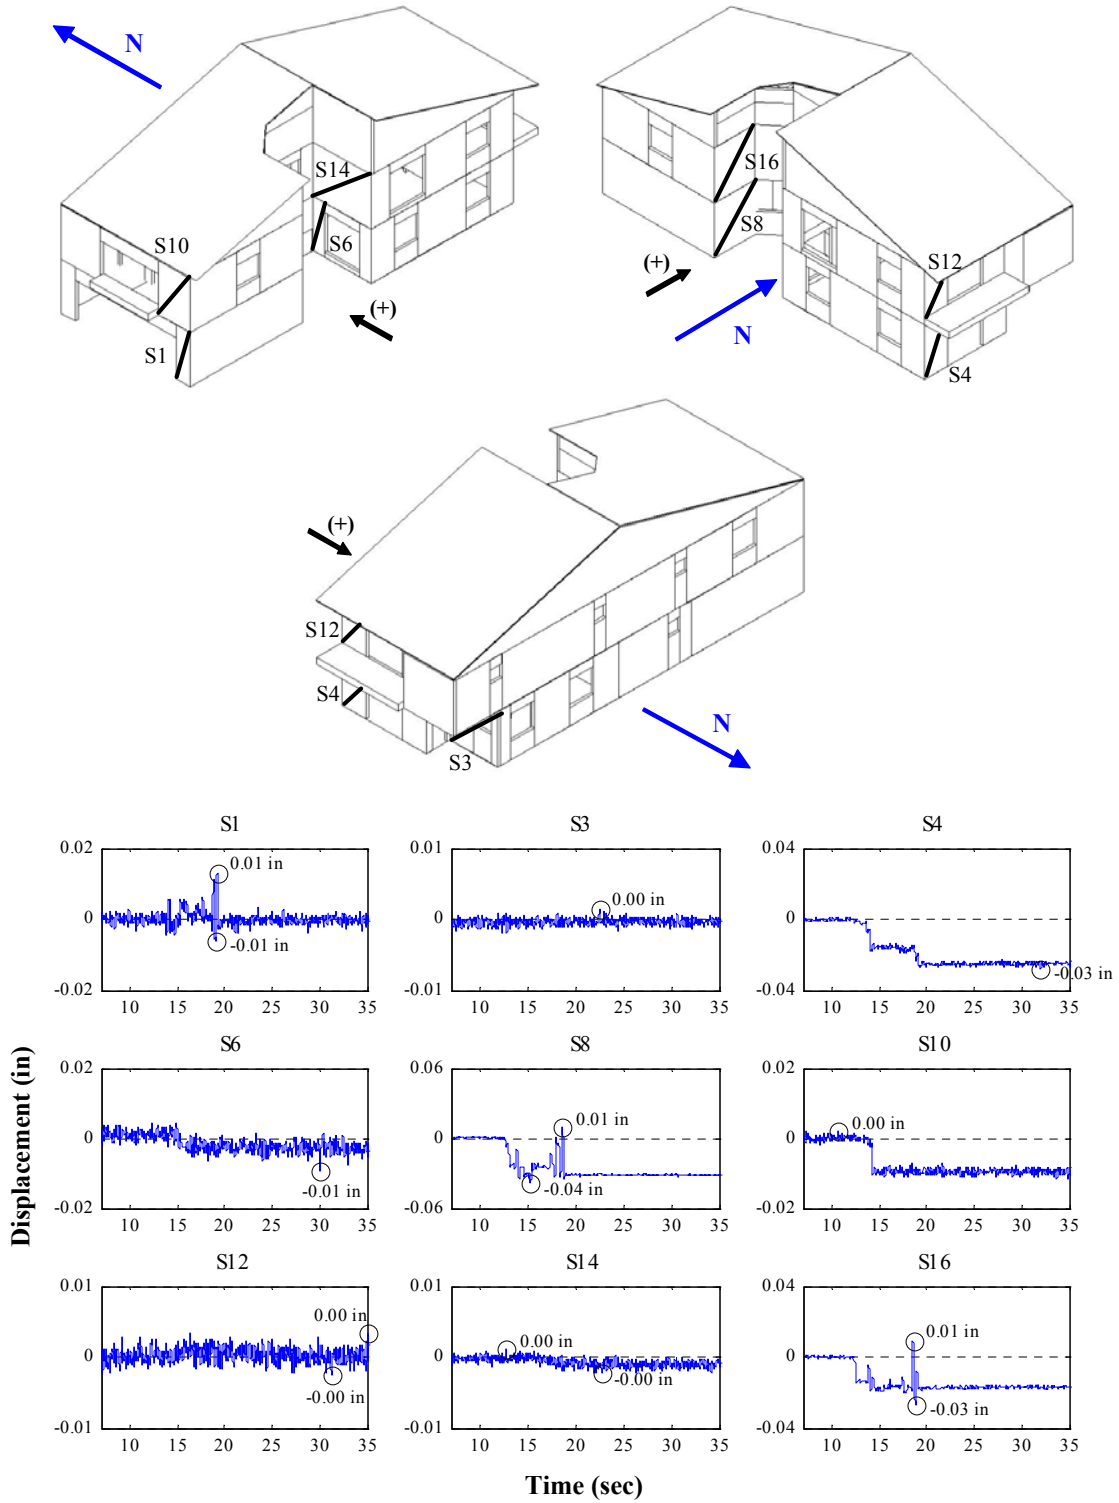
Wall deformations of north-south external walls for Test NWP2S24
